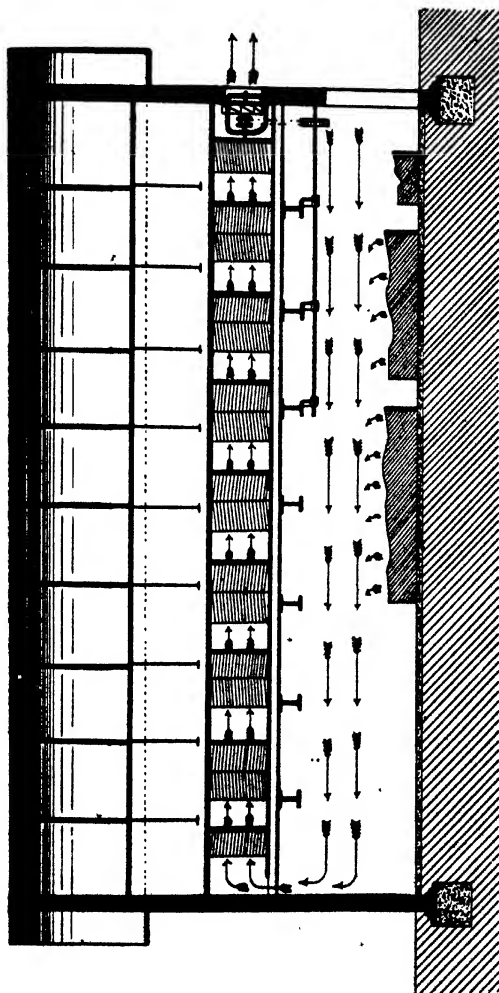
Application of Artificial Withering by means of Waste Heat where the Racks are arranged across the Room or Loft (longitudinal section).
